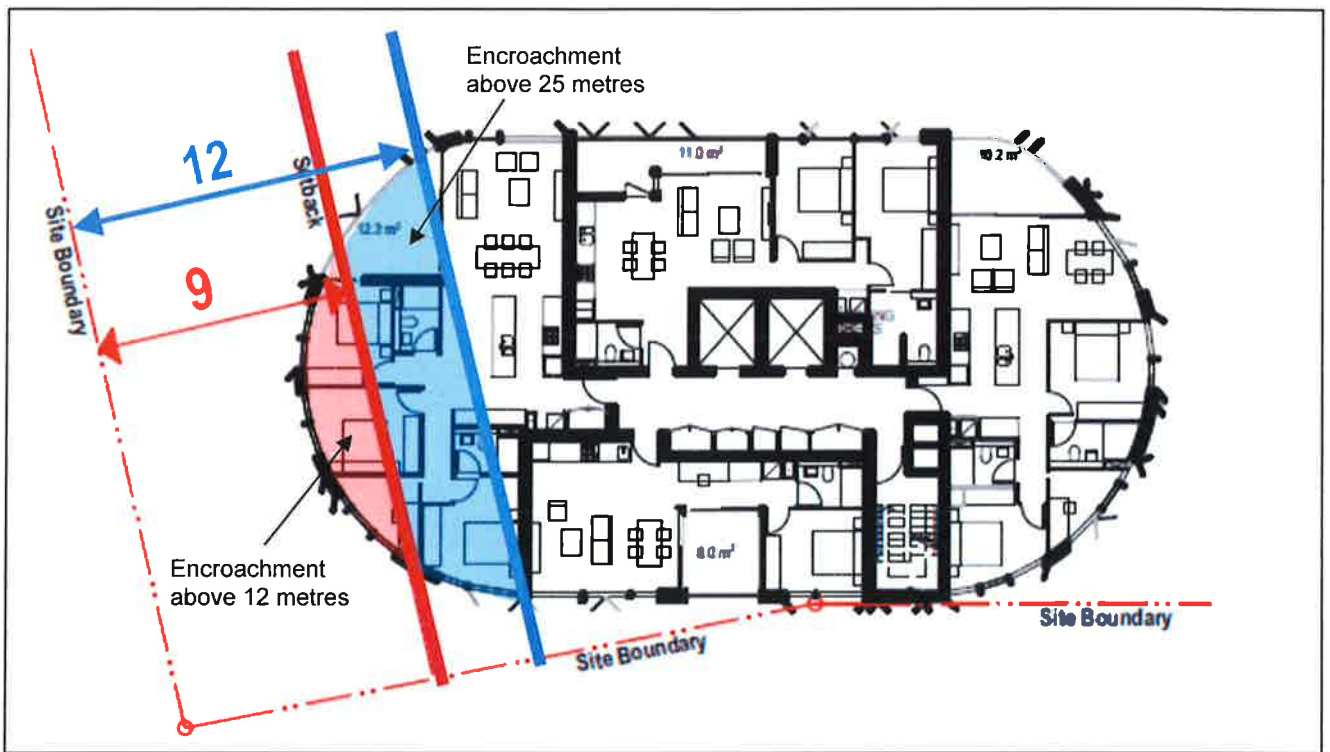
Typical floor plan levels 2-6 showing setback control encroachment (base image source: Modification Request)
